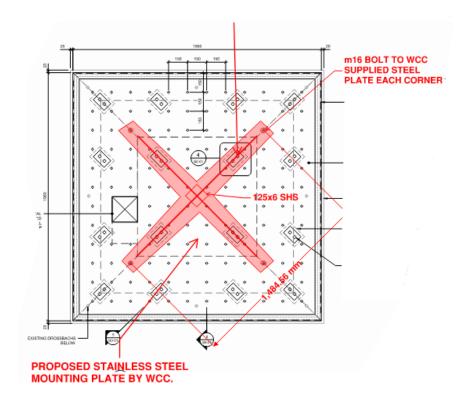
PLATE CRUSIFORM SECTION. 20mm PLATE SLOT THROUGH SHS AND WELD
